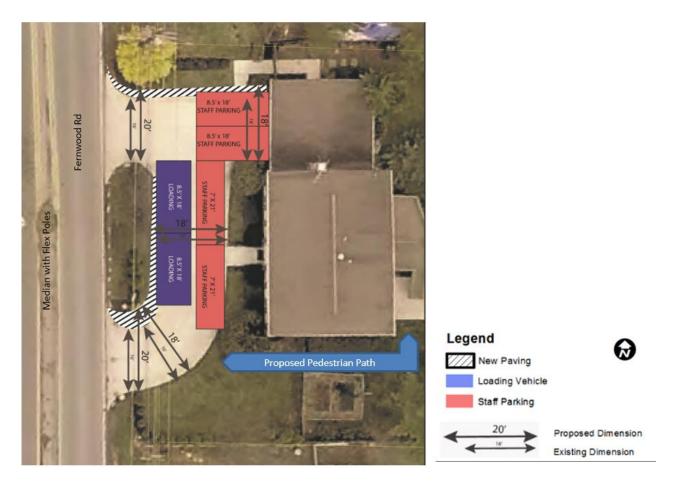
Staff and Applicant's Proposed Vehicular Circulation and Parking Plan
